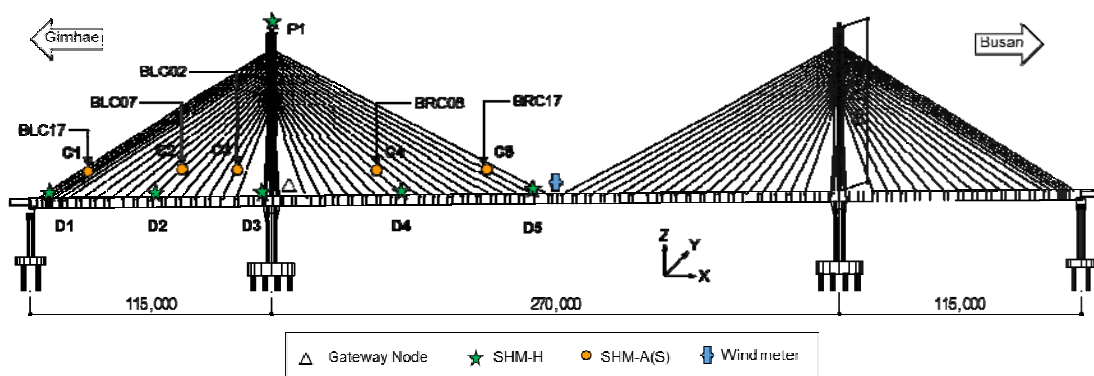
Sensor layout on Hwamyung cable-stayed bridge
